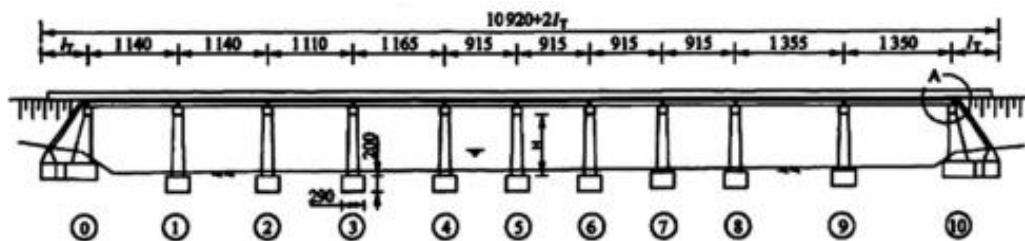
Layout of “Longtan Bridge” in China (Tang et al., 2007)
